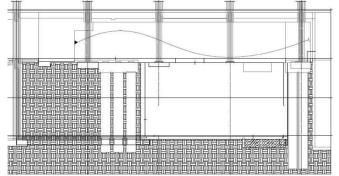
Construction of "transfer structure", introduction of building loads to the "transfer structure" followed by excavation to Concourse level.
